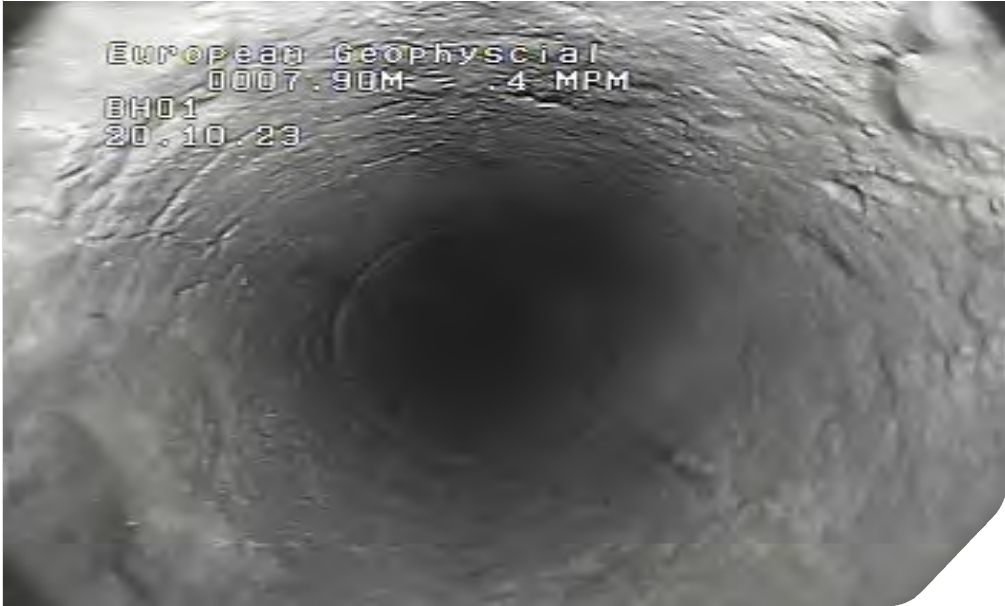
BH01 downhole view at 7.90 m bgl, borehole wall with no visible discontinuities.
